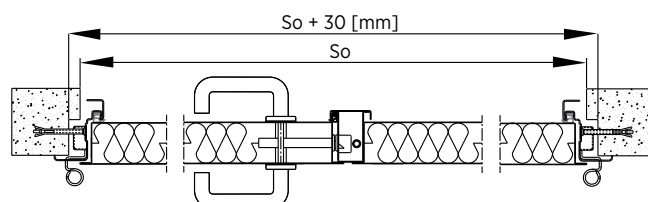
Installation of the double-leaf door with the corner frame in a masonry wall, horizontal cross-section
